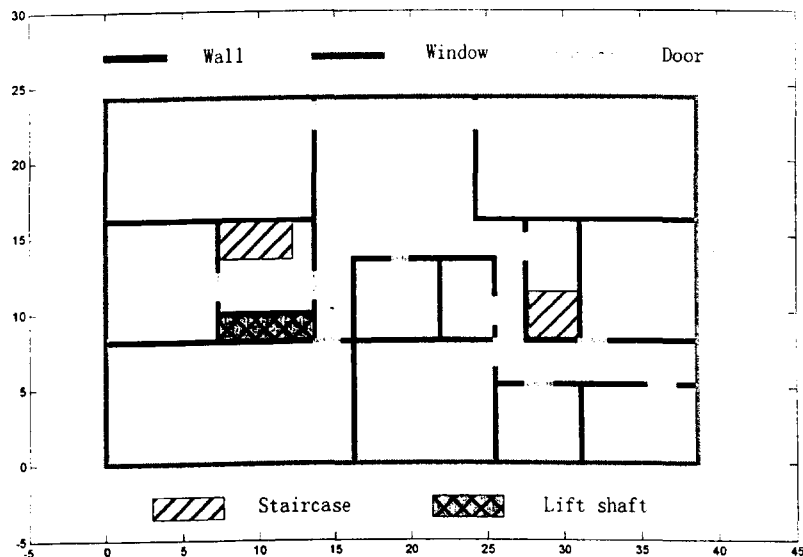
Blueprint of the second floor of the Electrical Engineering Building.
